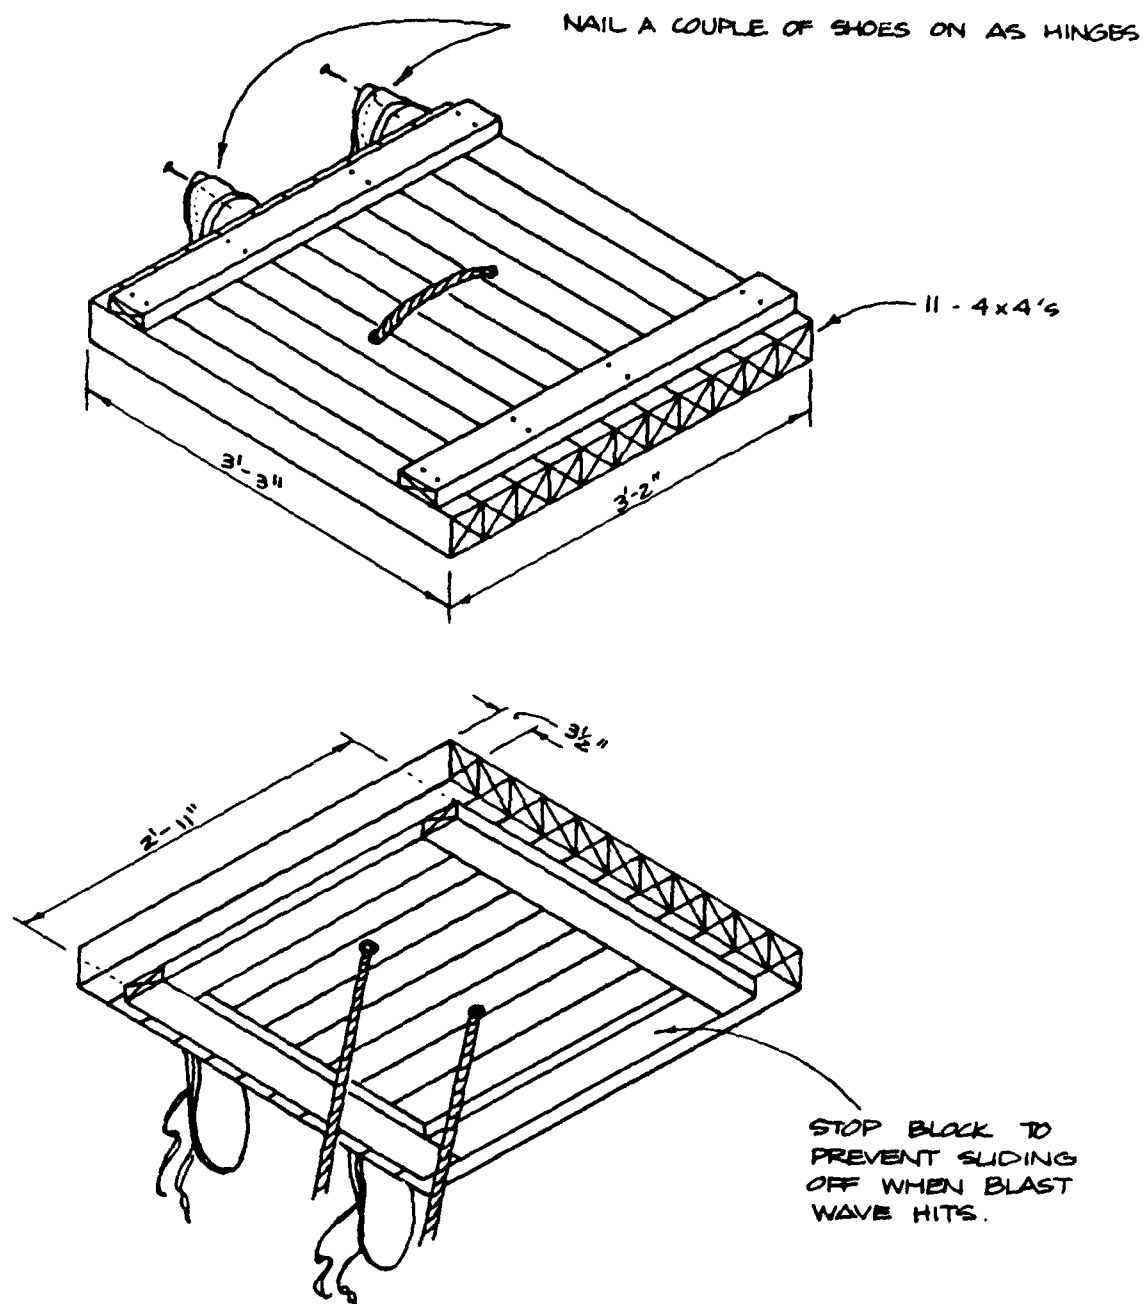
Closure for 40 psi Entrance Structure to Key Worker Shelter (Wood Construction).
